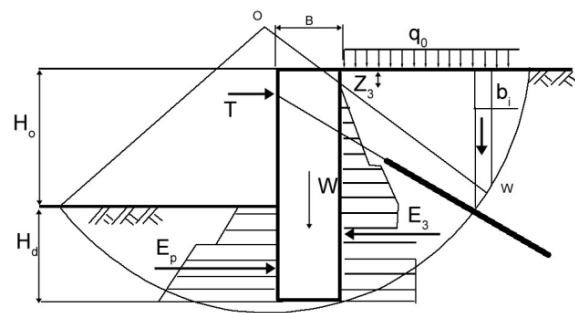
The Designed Computation Model of Cement-soil Pile with Anchor Supporting Structure.
